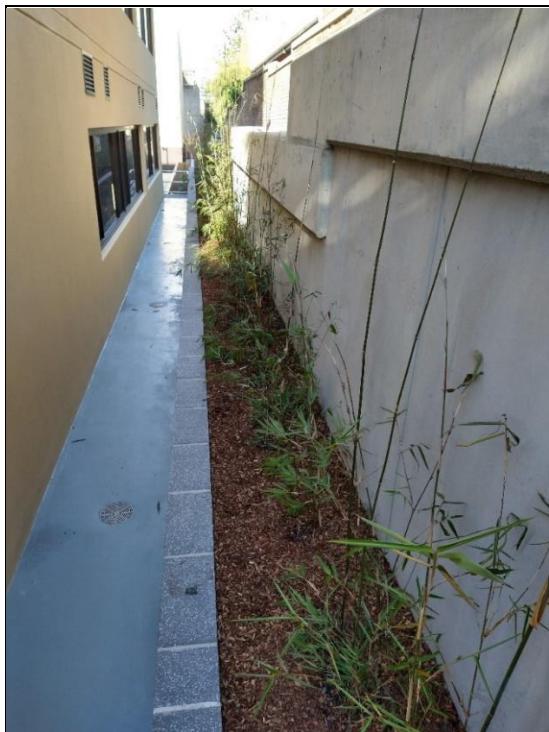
Looking east at garden bed along southern site boundary adjacent Education Building.
